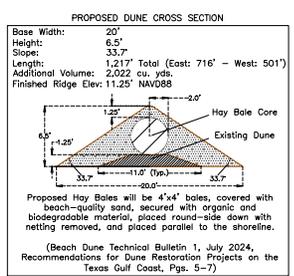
EXHIBIT Proposed Site Plan Seagrass Beach, Gilchrist, TX, 77617
